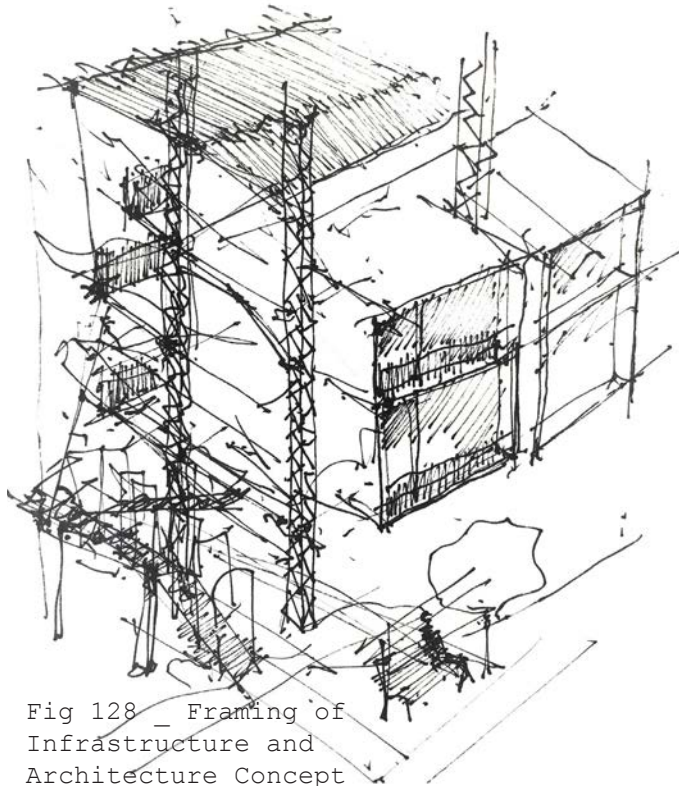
Framing of Infrastructure and Architecture Concept Drawing | Prefab Indication (Author, 2017)
